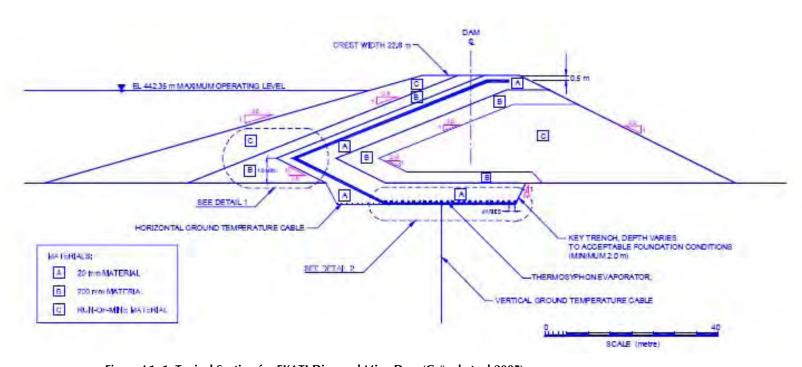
1: Typical Section for EKATI Diamond Mine Dam (Gräpel et. al 2005)
